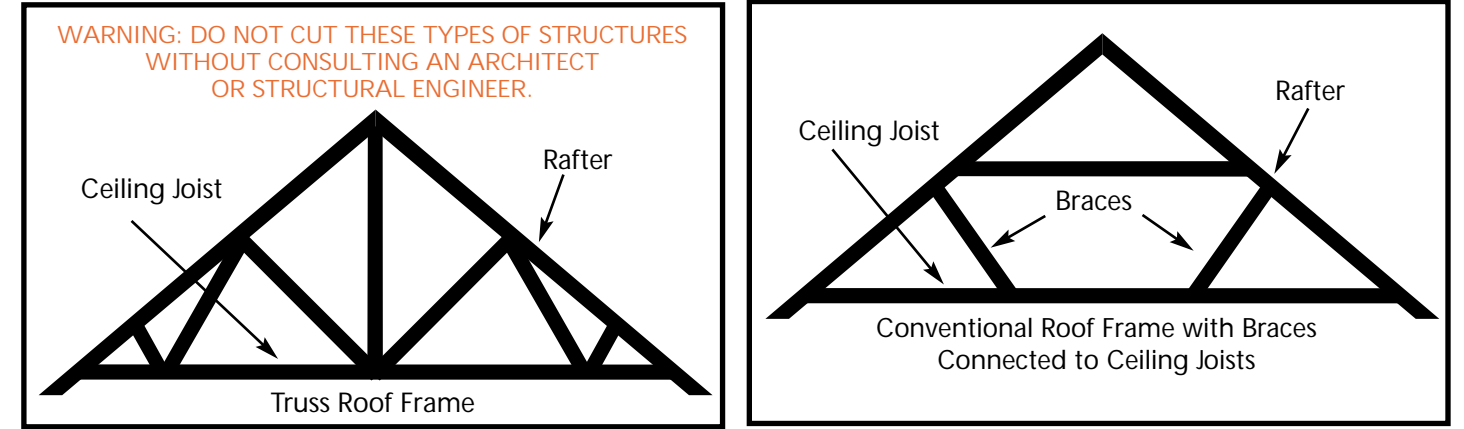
Truss roof frame and conventional roof frame with braces connected to ceiling joists.
